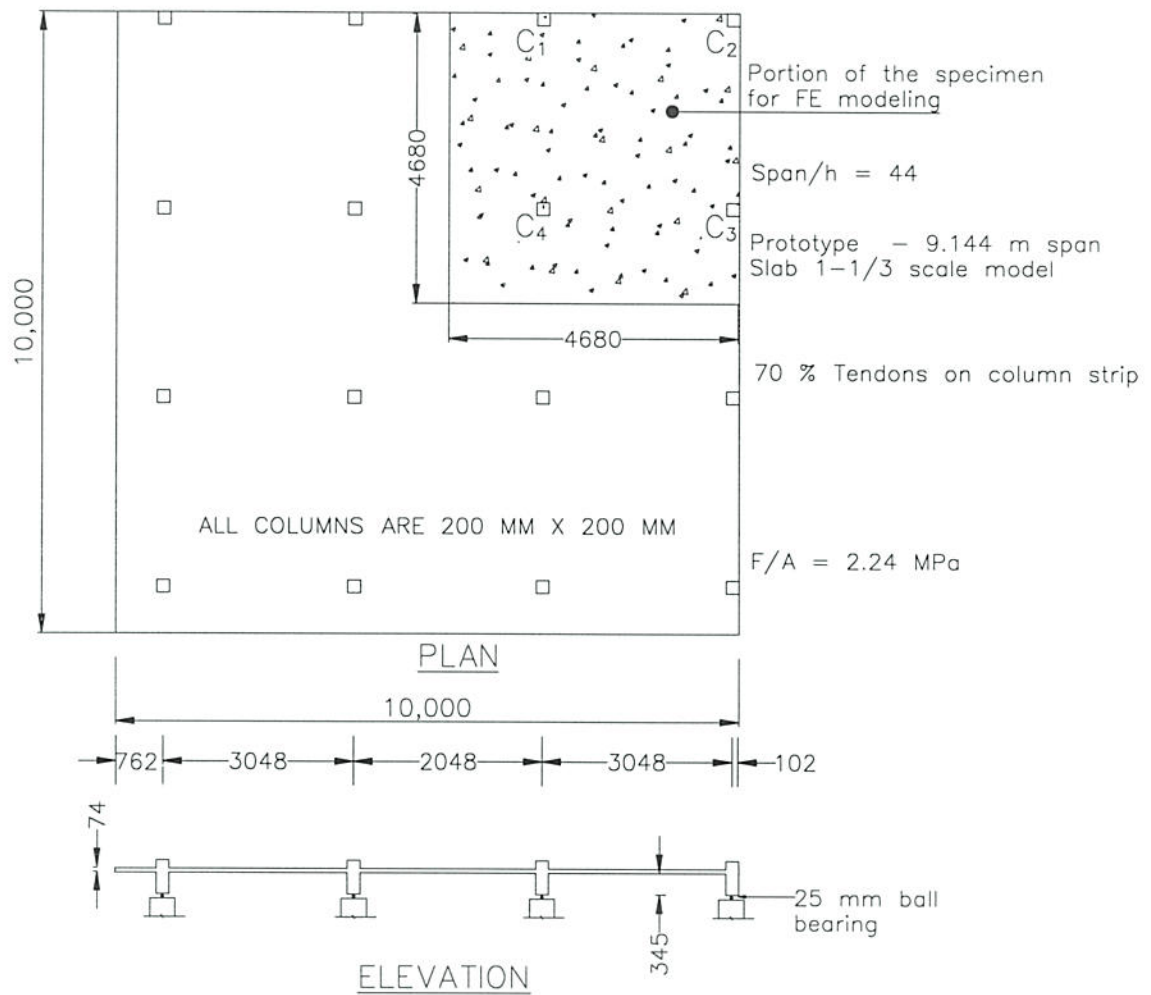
Plan and elevation of slab-column connection with the portion used for finite element analyses for the Burns and Hemakom (1977) slab.
